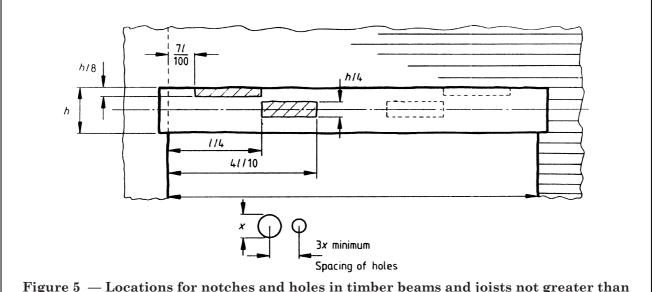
Locations for notches and holes in timber beams and joists not greater than  $250~\mathrm{mm}$  high
